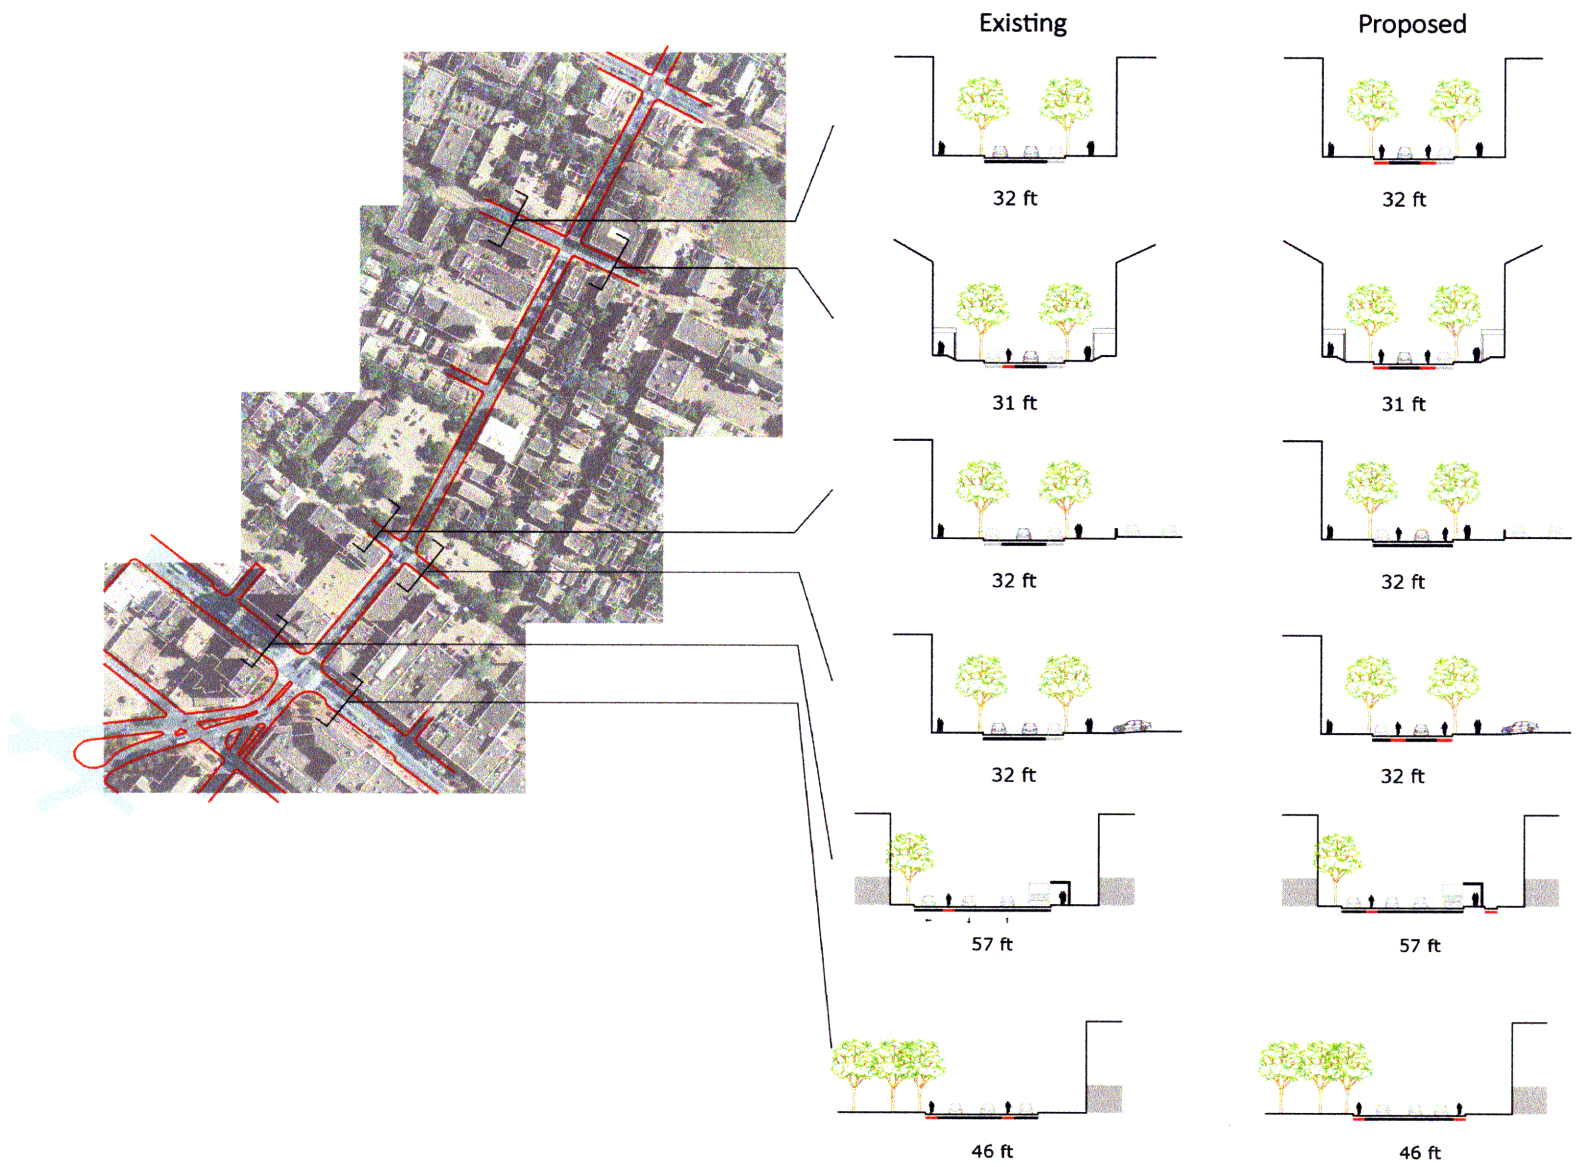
Existing and improved street sections for Massachusetts Avenue, Allen Street and Harvard Street.
